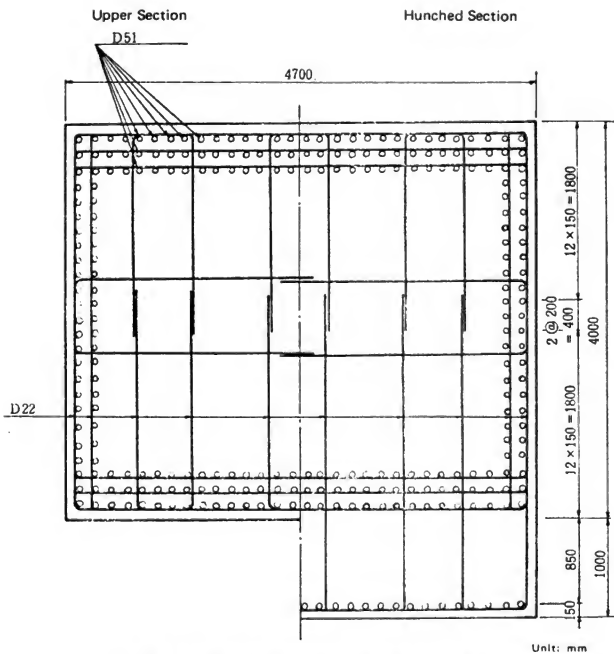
Section of the Upper Column of Ban-no-su Bridge Pier
